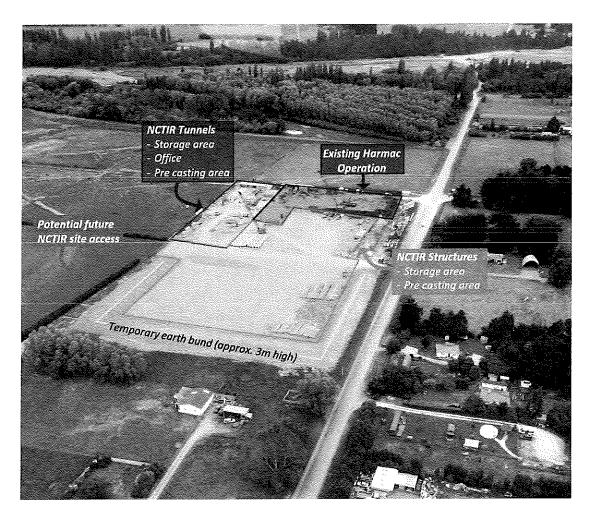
YARD LAYOUT - INDICATIVE AREAS
